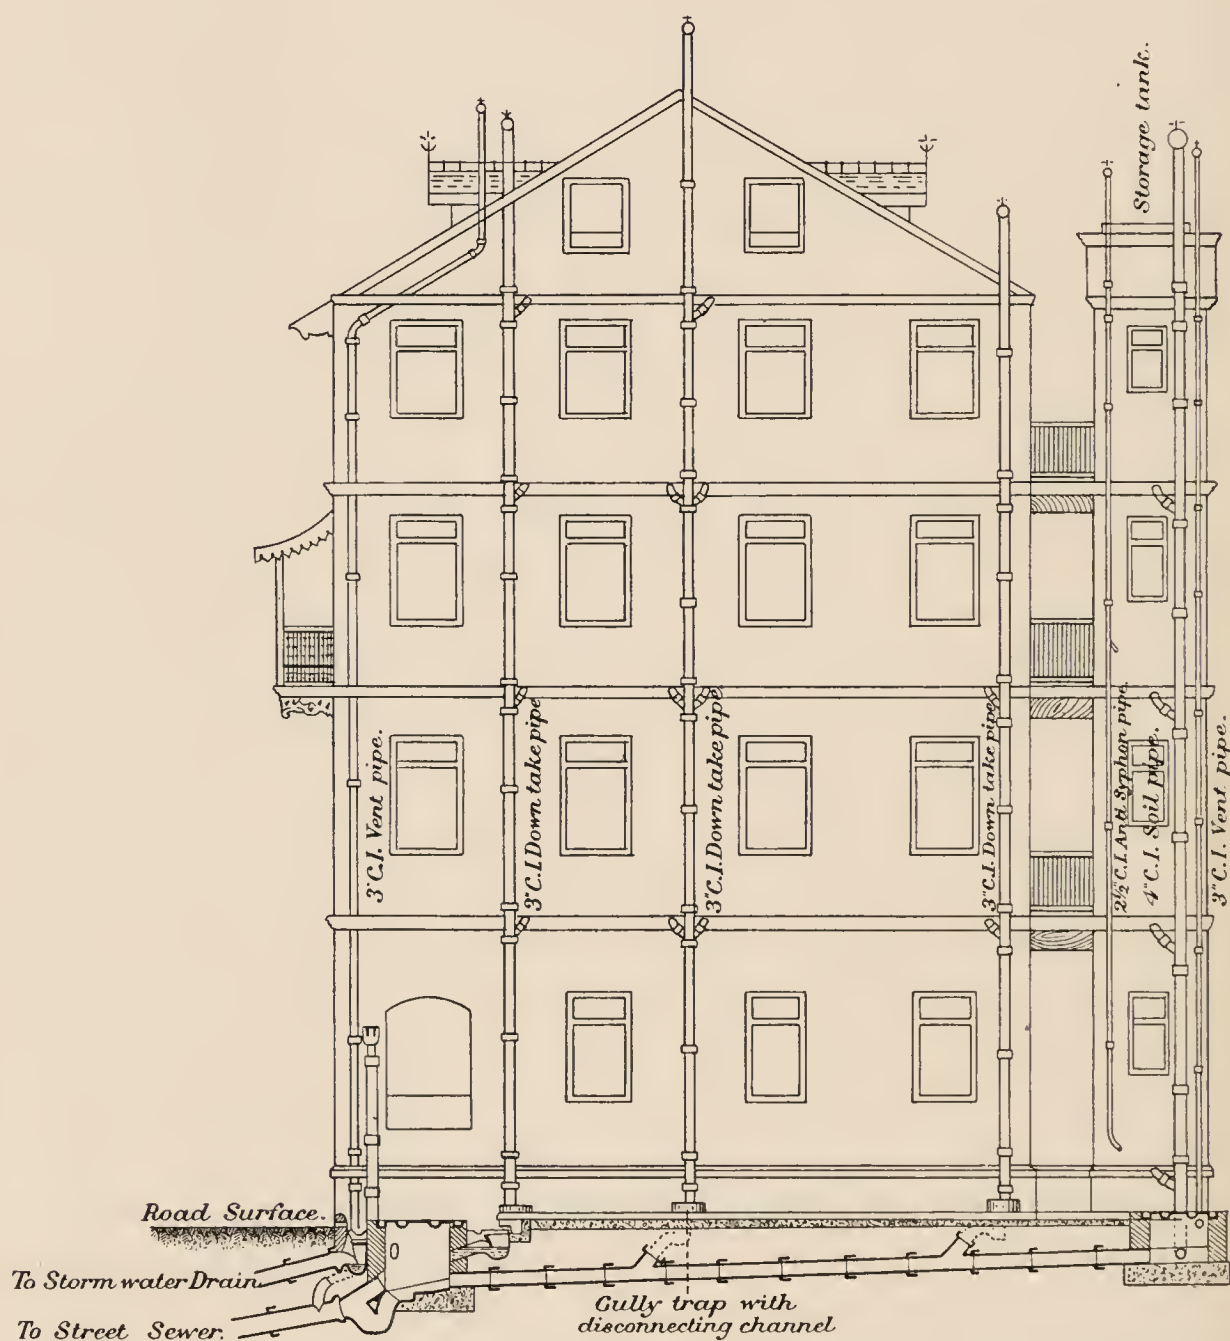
House with latrines arranged in separate tower approached by verandahs.
